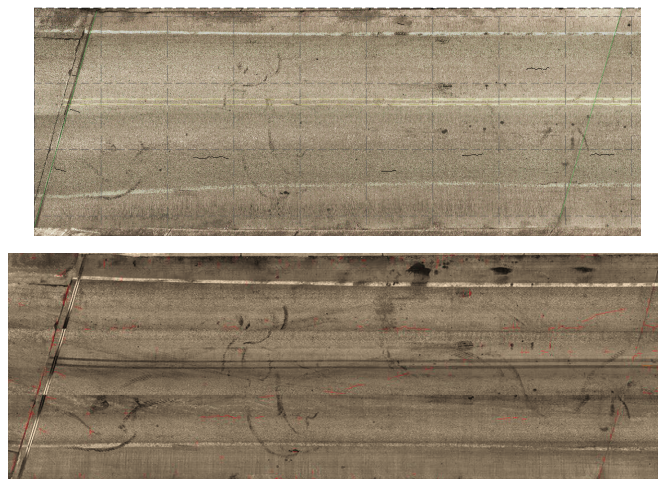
Existing Cracks of Bridge Deck No. 22266-Span 1
